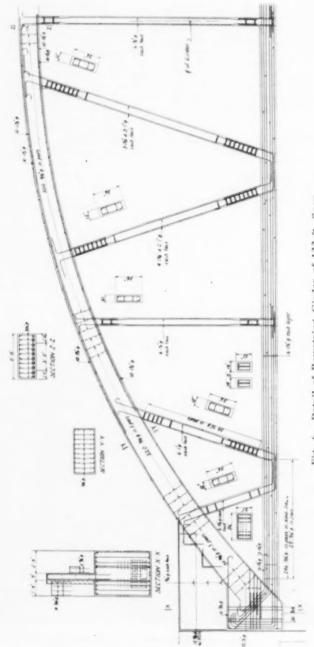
Detail of Bowstring Girder of 132-ft. Span.
